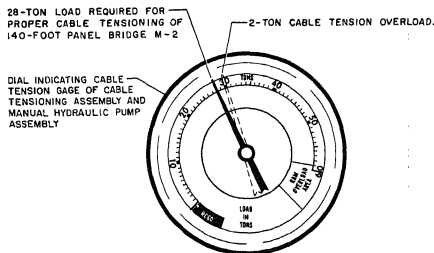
Typical example of load adjustment to eliminate cable friction as indicated on dial indicating cable tension gage.
